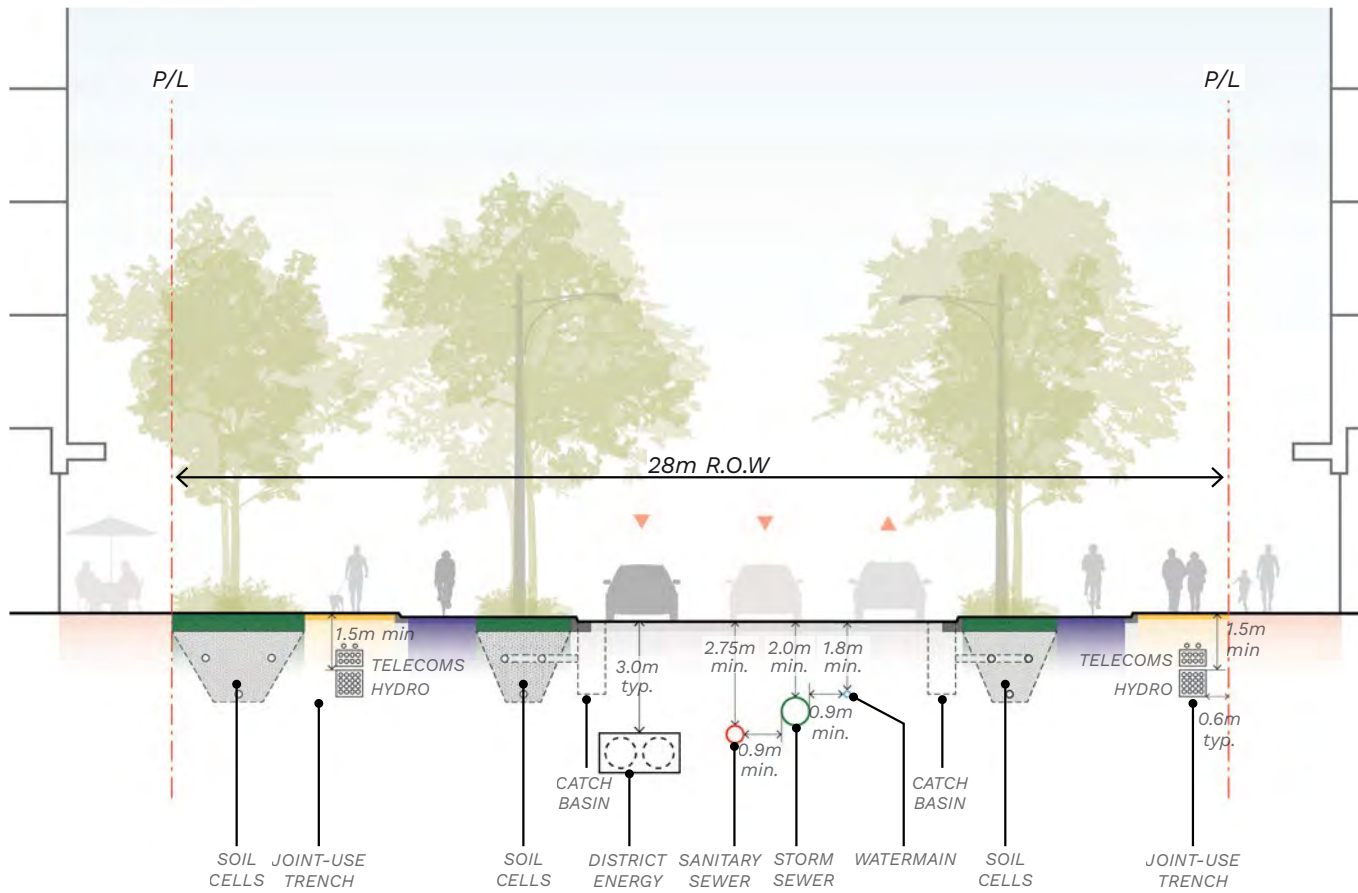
Conceptual 28 metre right-of-way showing potential underground infrastructure.
